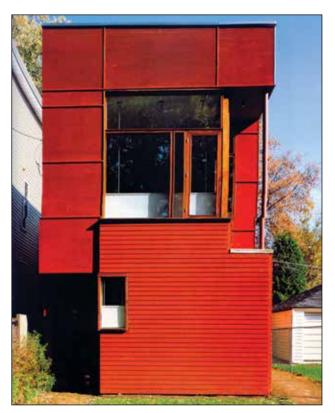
The façade performed in combination of wooden plate cladding and wooden cladding from single elements, House in Toronto, Canada, Shim -Sutcliffe Architects - architectural team, 1994 [3]
